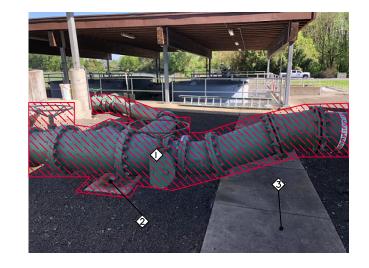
PHOTO: EXISTING DAF & GRAVITY FILTER PIPING
